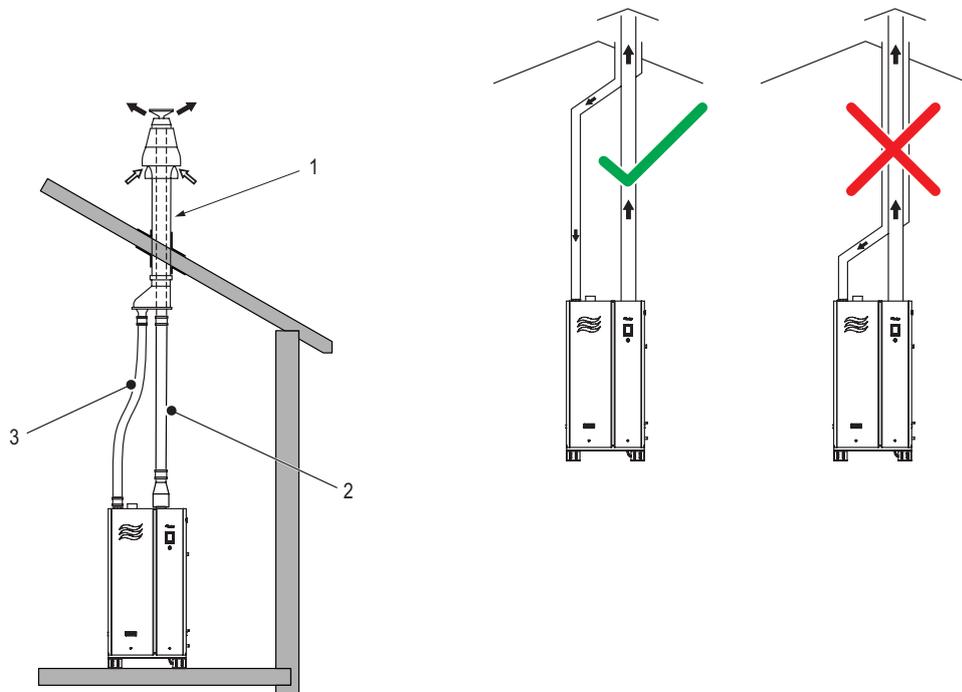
Type C33 Exhaust Venting for Room Seal Installations
